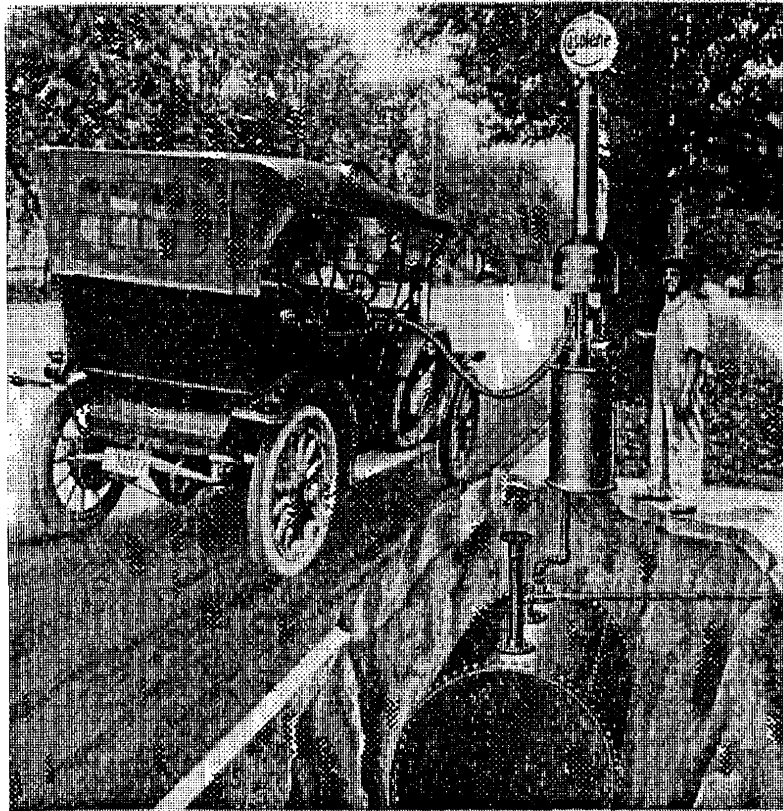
Proper Underground Storage Tank Installation, ca. 1913. Source: Illinois State Fire Marshal (1916).
